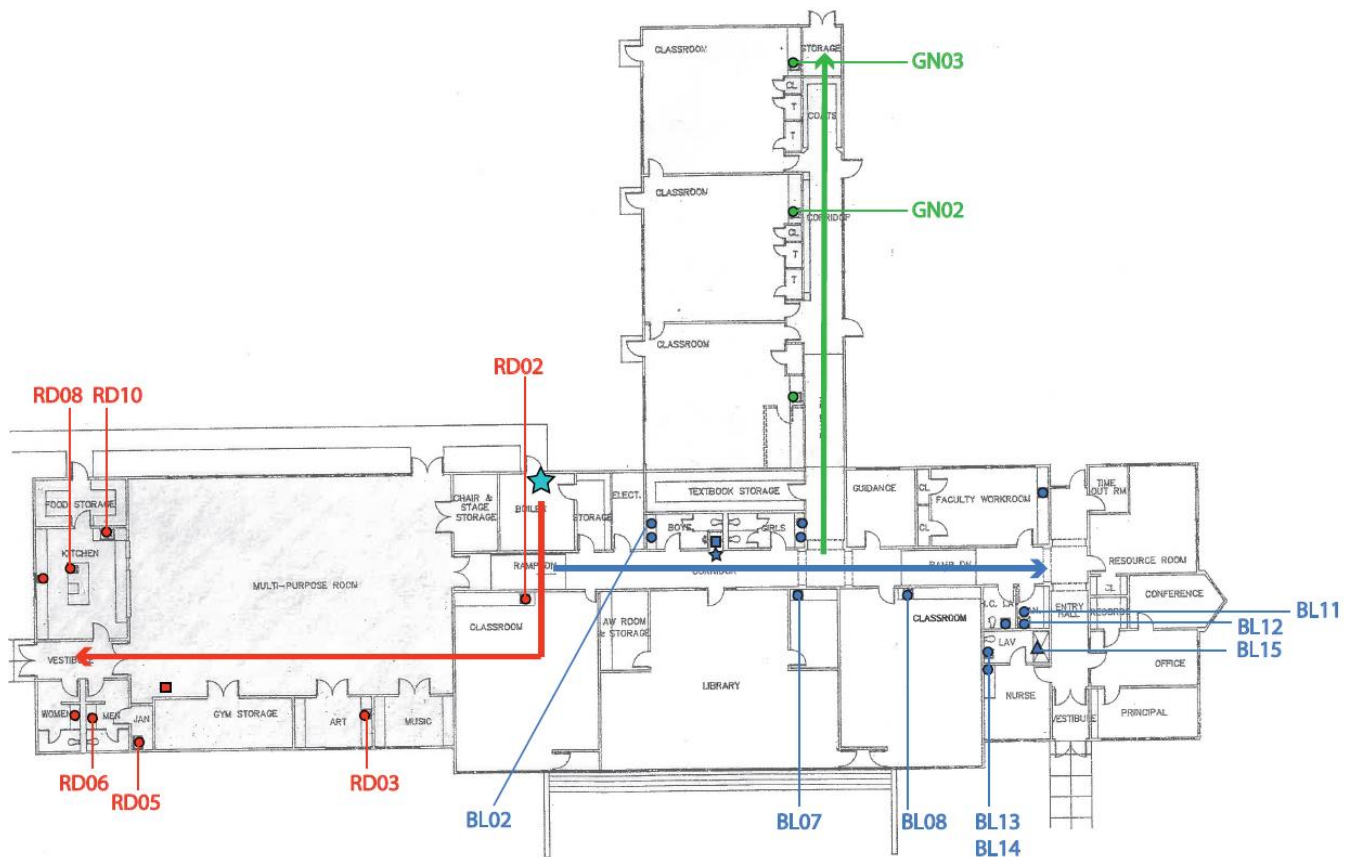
Floor plan showing locations of Weybridge Elementary School outlets that exceeded the EPA action level or the American Academy of Pediatrics safety level (see also Table1).
